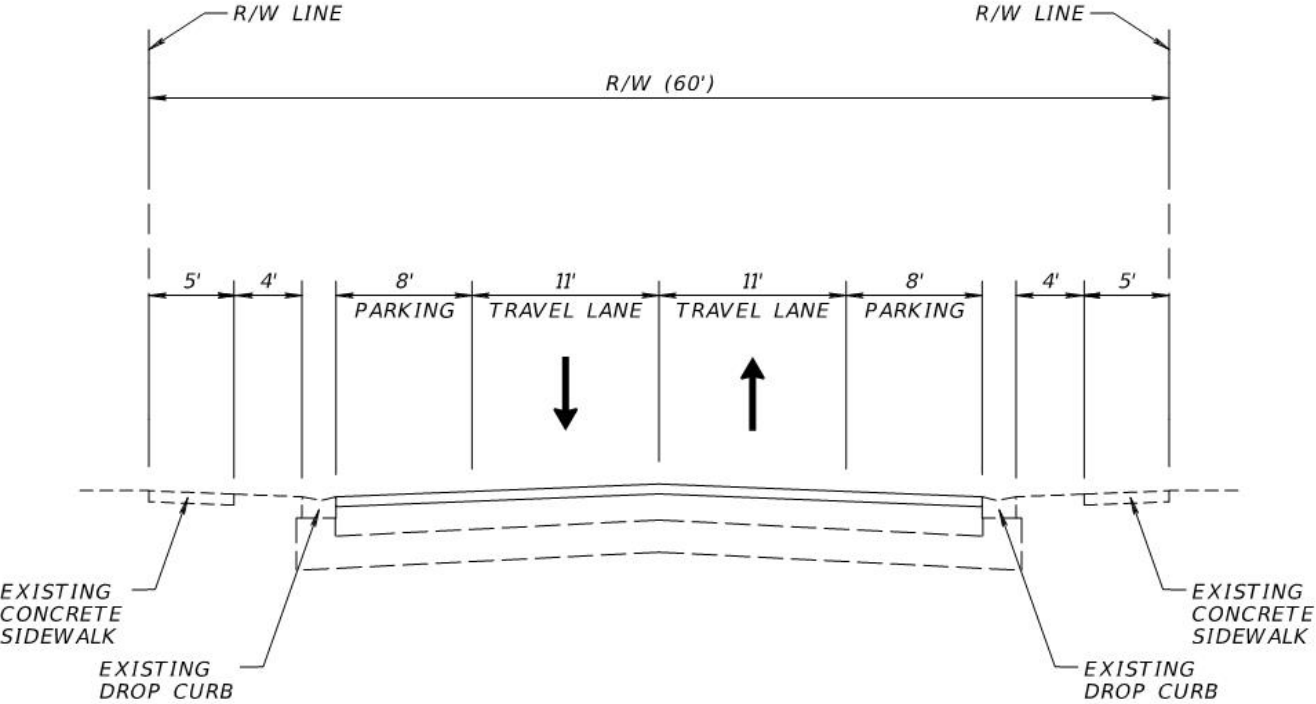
Alcaniz Street at Wright Street – North Approach Facing South
